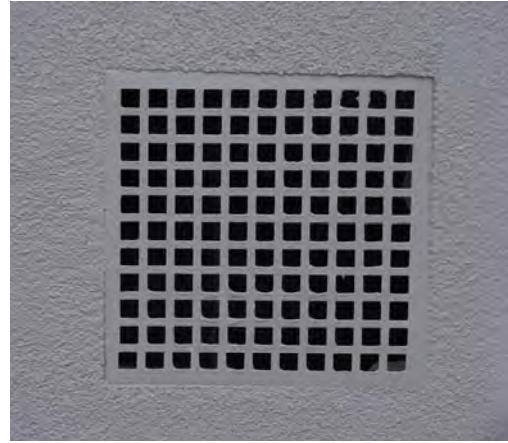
Ventilation grille detail of the rendered perimeter foundation wall
